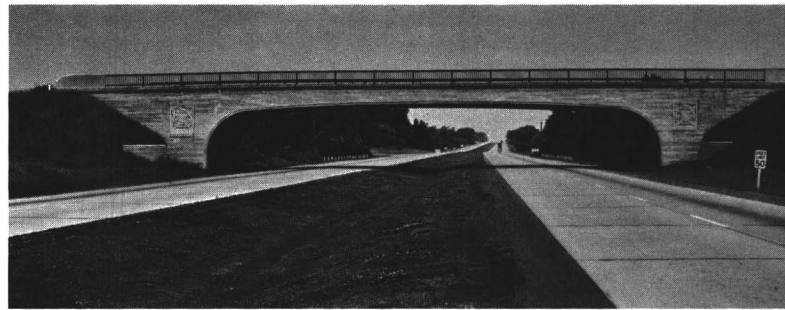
This long-span rigid-frame box-girder bridge near Toronto, Ont., Canada, provides safety through maximum visibility and unrestricted passage. Design: Department of Highways, Ont., Canada. Construction: Bailey Construction Co., Toronto, Ont., Canada.
